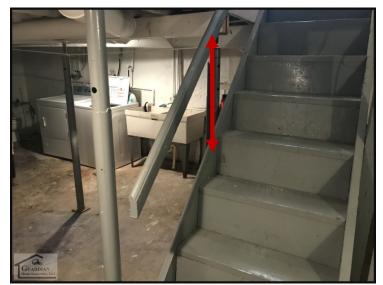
As there is a danger of falling, a step railing should be provided along at least one side of the basement stairway.
